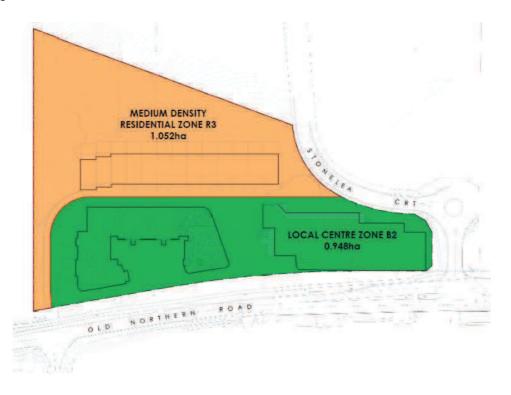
Site Plan showing split of B2 and R3 land use zone areas
